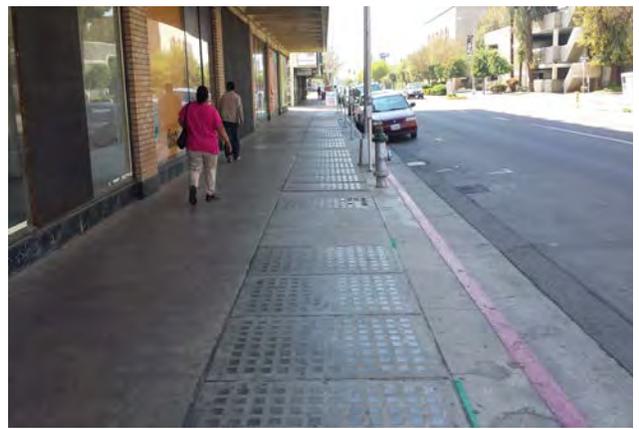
Radin Kamp/J.C. Penney Building Sidewalk Vault Lights
